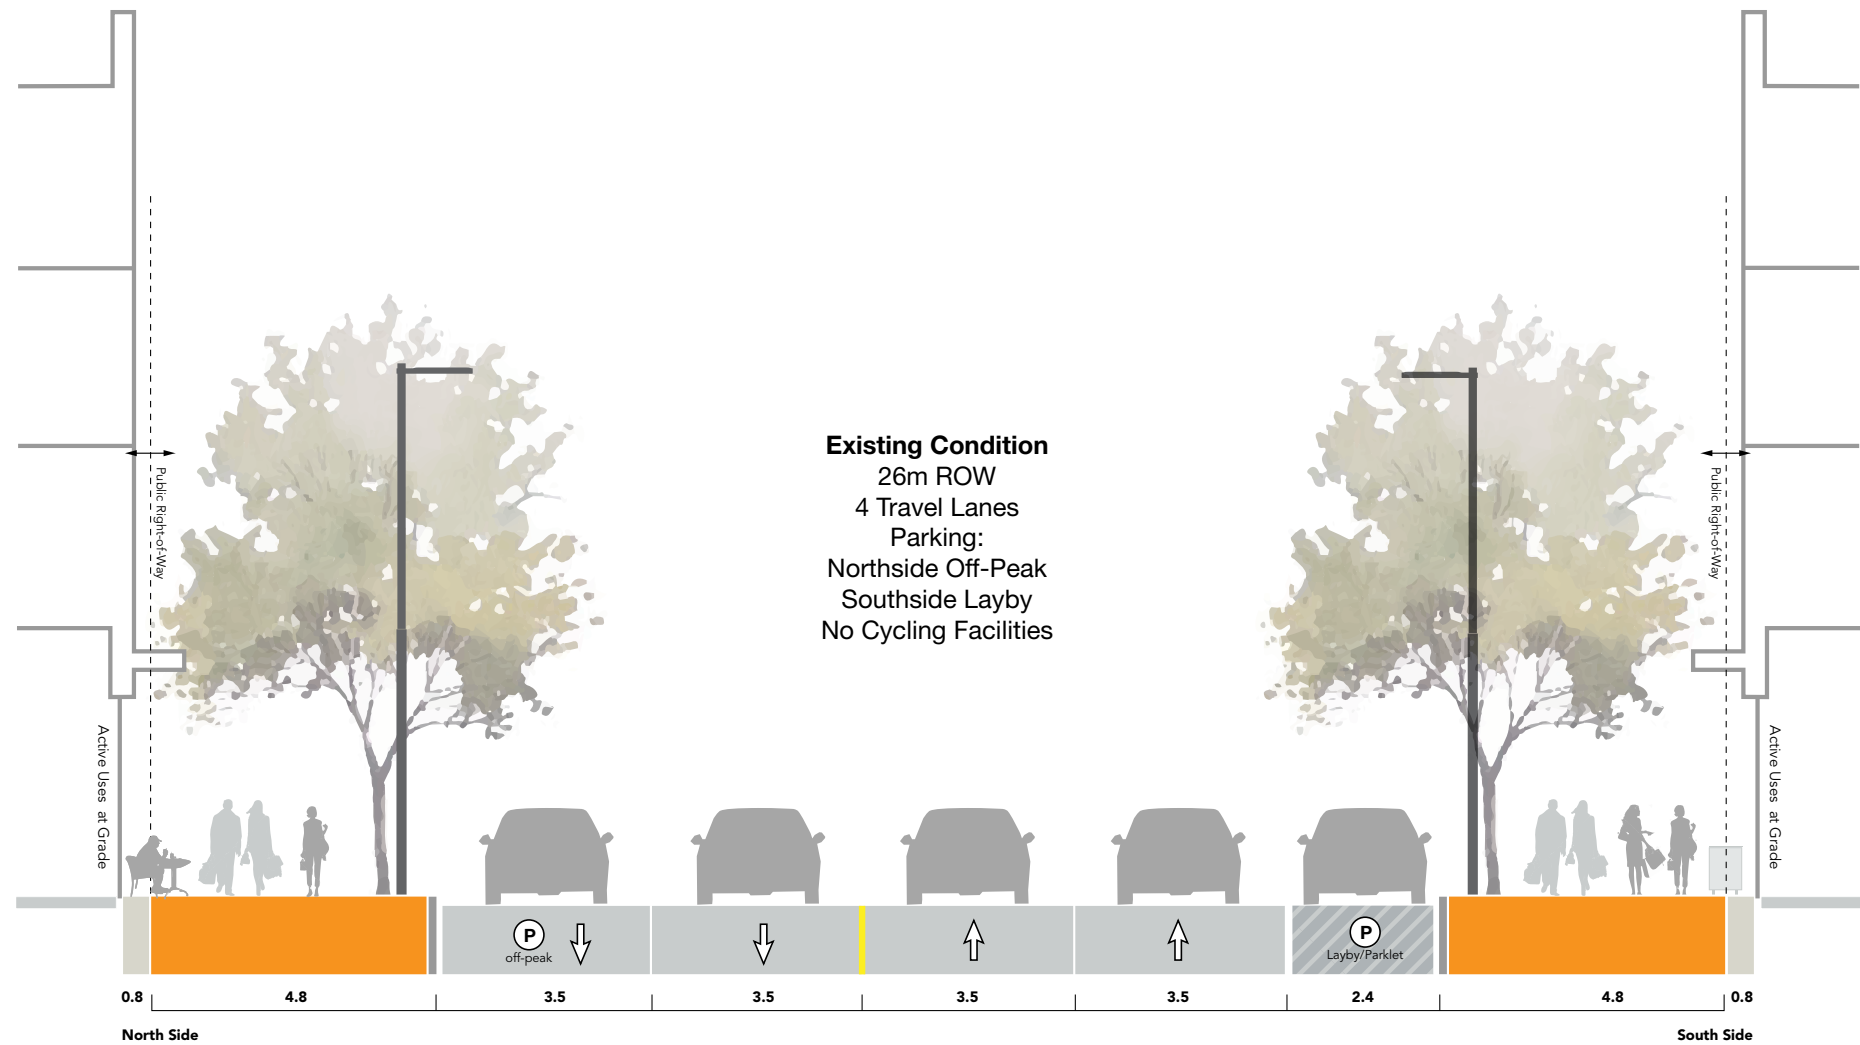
Bloor Street West. 26m ROW. Existing Condition
